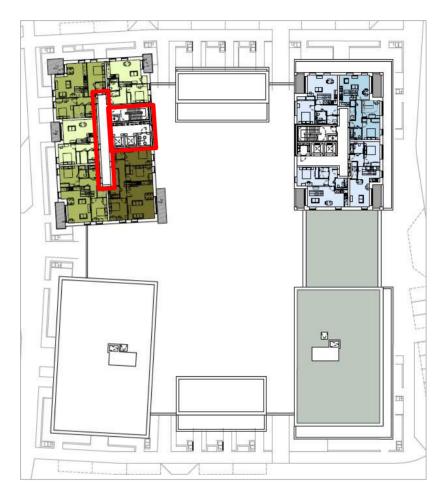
Block E 11th floor, top floor communal Corridor (Patel Taylor drawings 21.09.2020).
